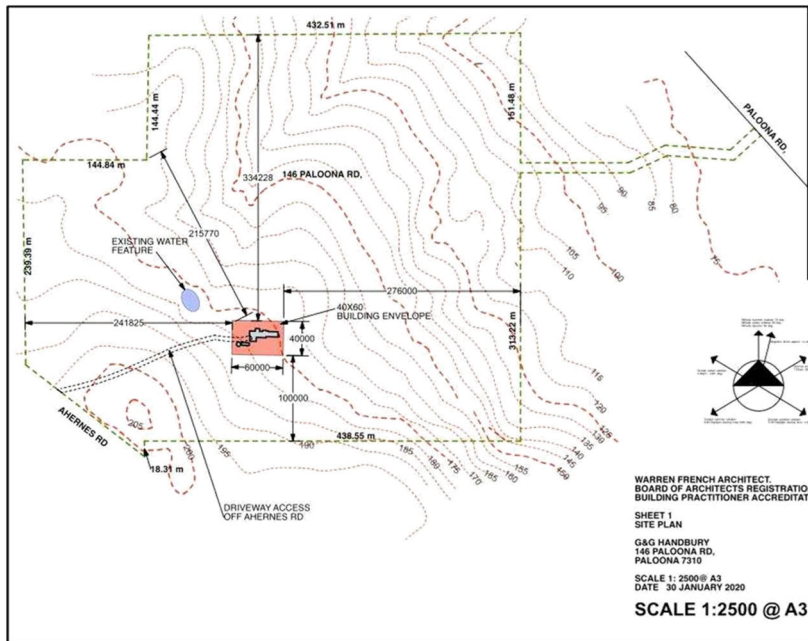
Image showing location of proposed building envelope. (in red) and site constraints
